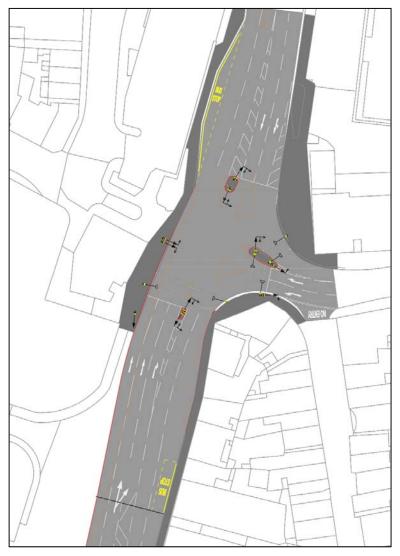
Washington Street / Ramsay Brow Proposed Improvement Design
